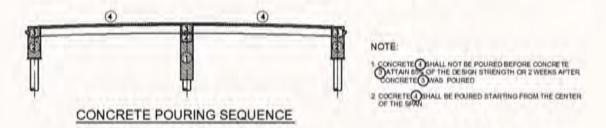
A Sample of Concrete Pouring Sequence of Integral Type Bridge
